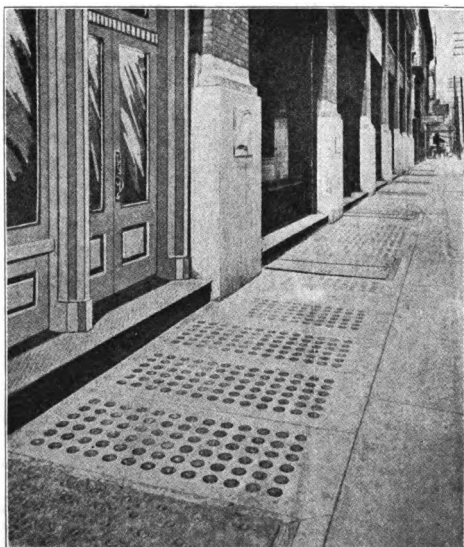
Reinforced concrete side-walk lights, Power Building, Cincinnati, built by the Ferro-Concrete Construction Co. Cincinnati.
